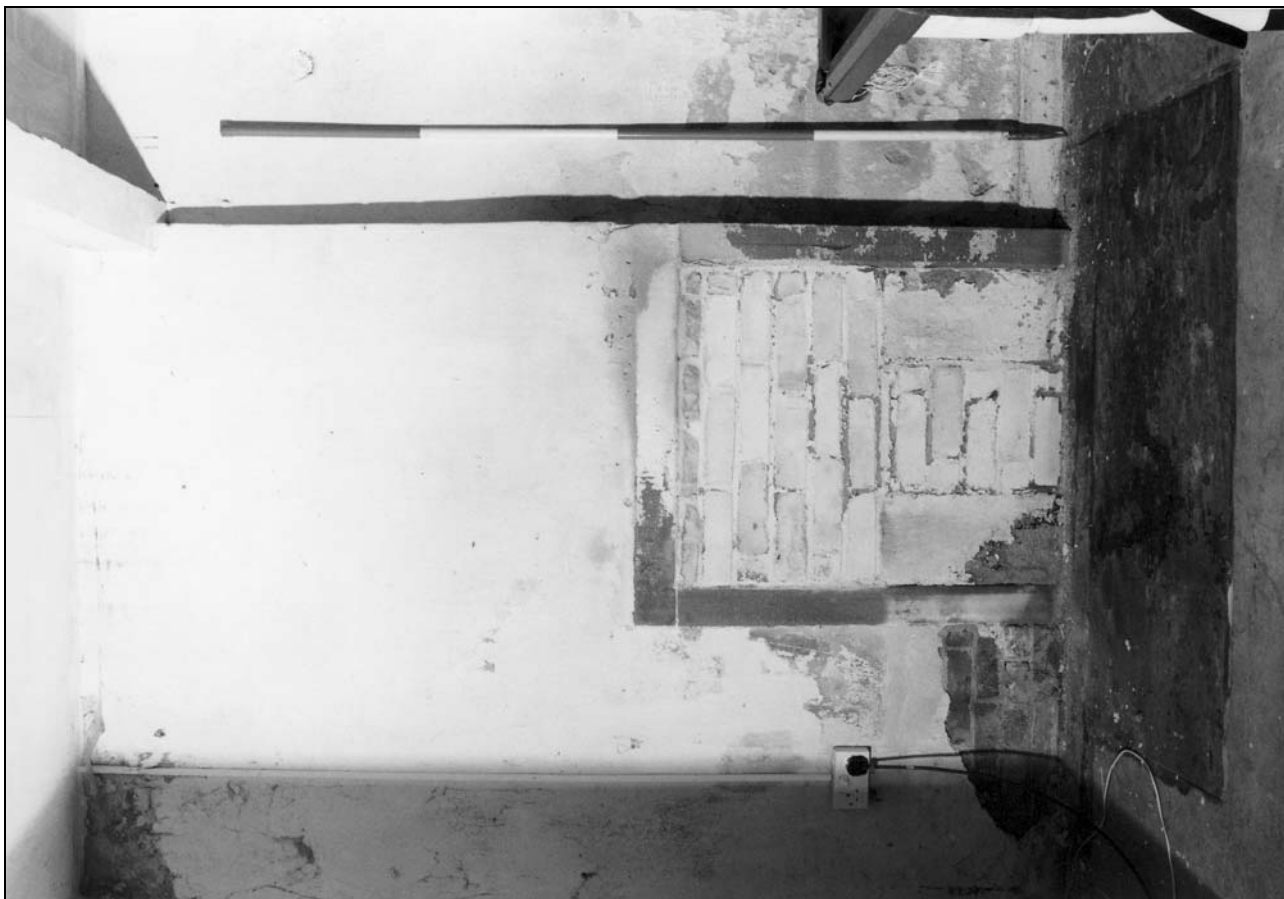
Blocked fireplace on first floor of workshop (south part), from the west (film 4, frame 6)
